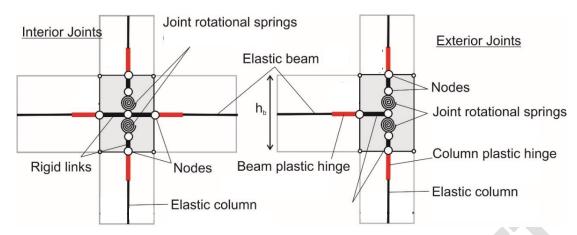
C.2: Rotational joint spring model for non-ductile beam-column joint element (adapted from Kam, 2010)
